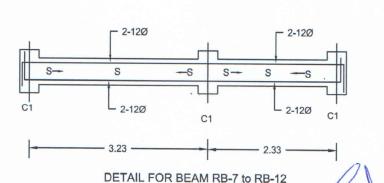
DETAILED DRAWING OF REINFORCEMENT OF BEAMS AT ROOF LEVEL
